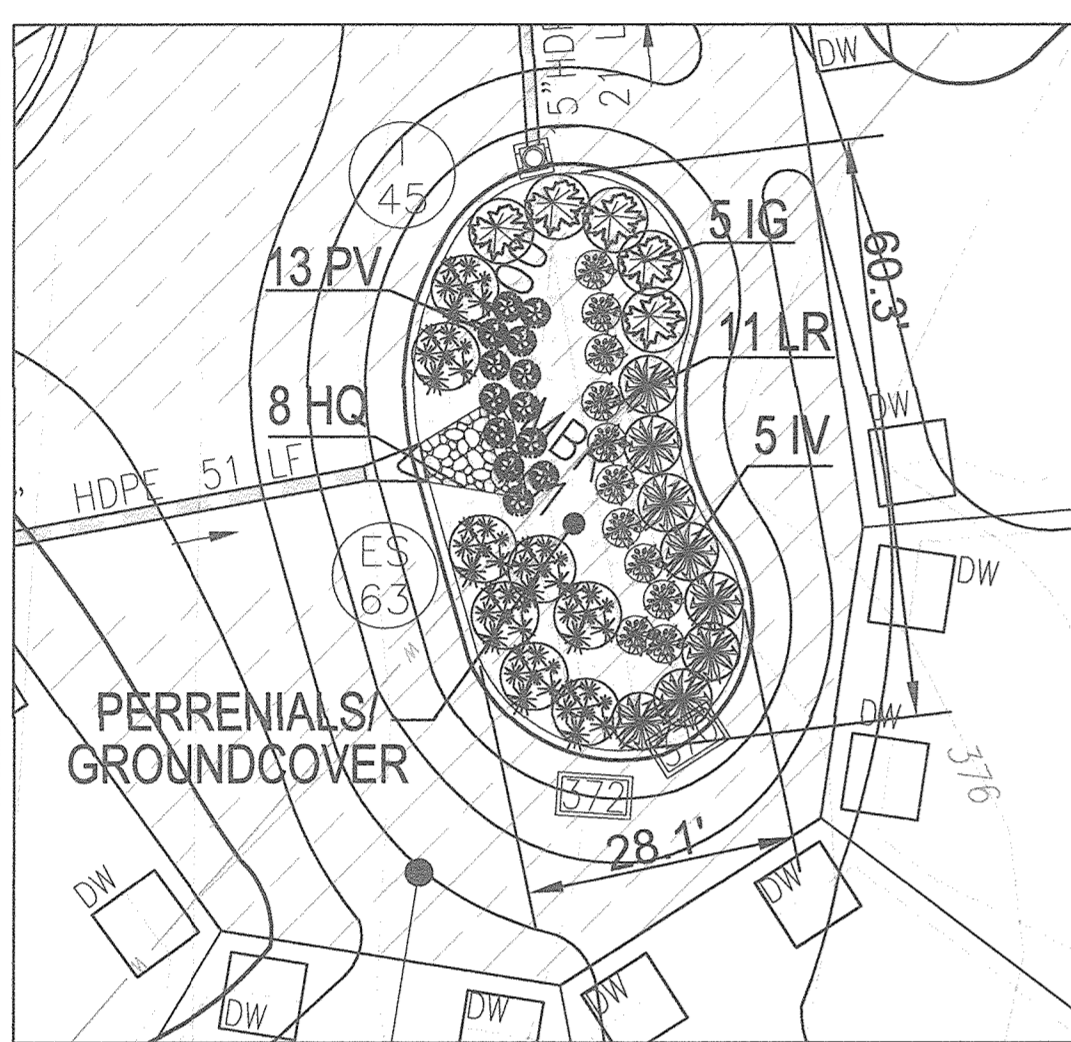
DETAILED BIO AND PLANTING PLAN (SWM #59)
